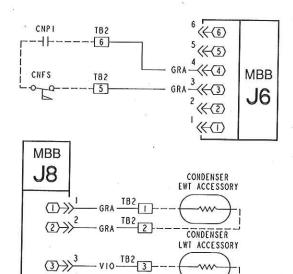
Condenser Flow Switch Interlock and Entering/Leaving Water Thermistor Wiring; 30HXC Units
